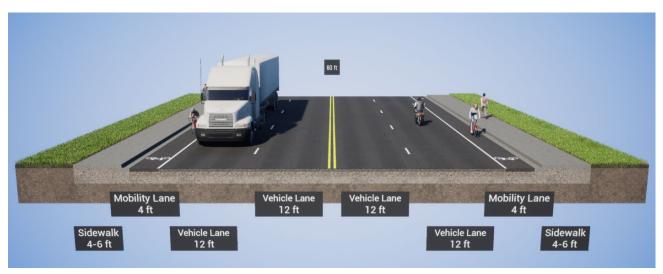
Proposed Typical Roadway Configuration of Segment 5: Minnehaha Street to NE 68th Street/Railroad Tracks
